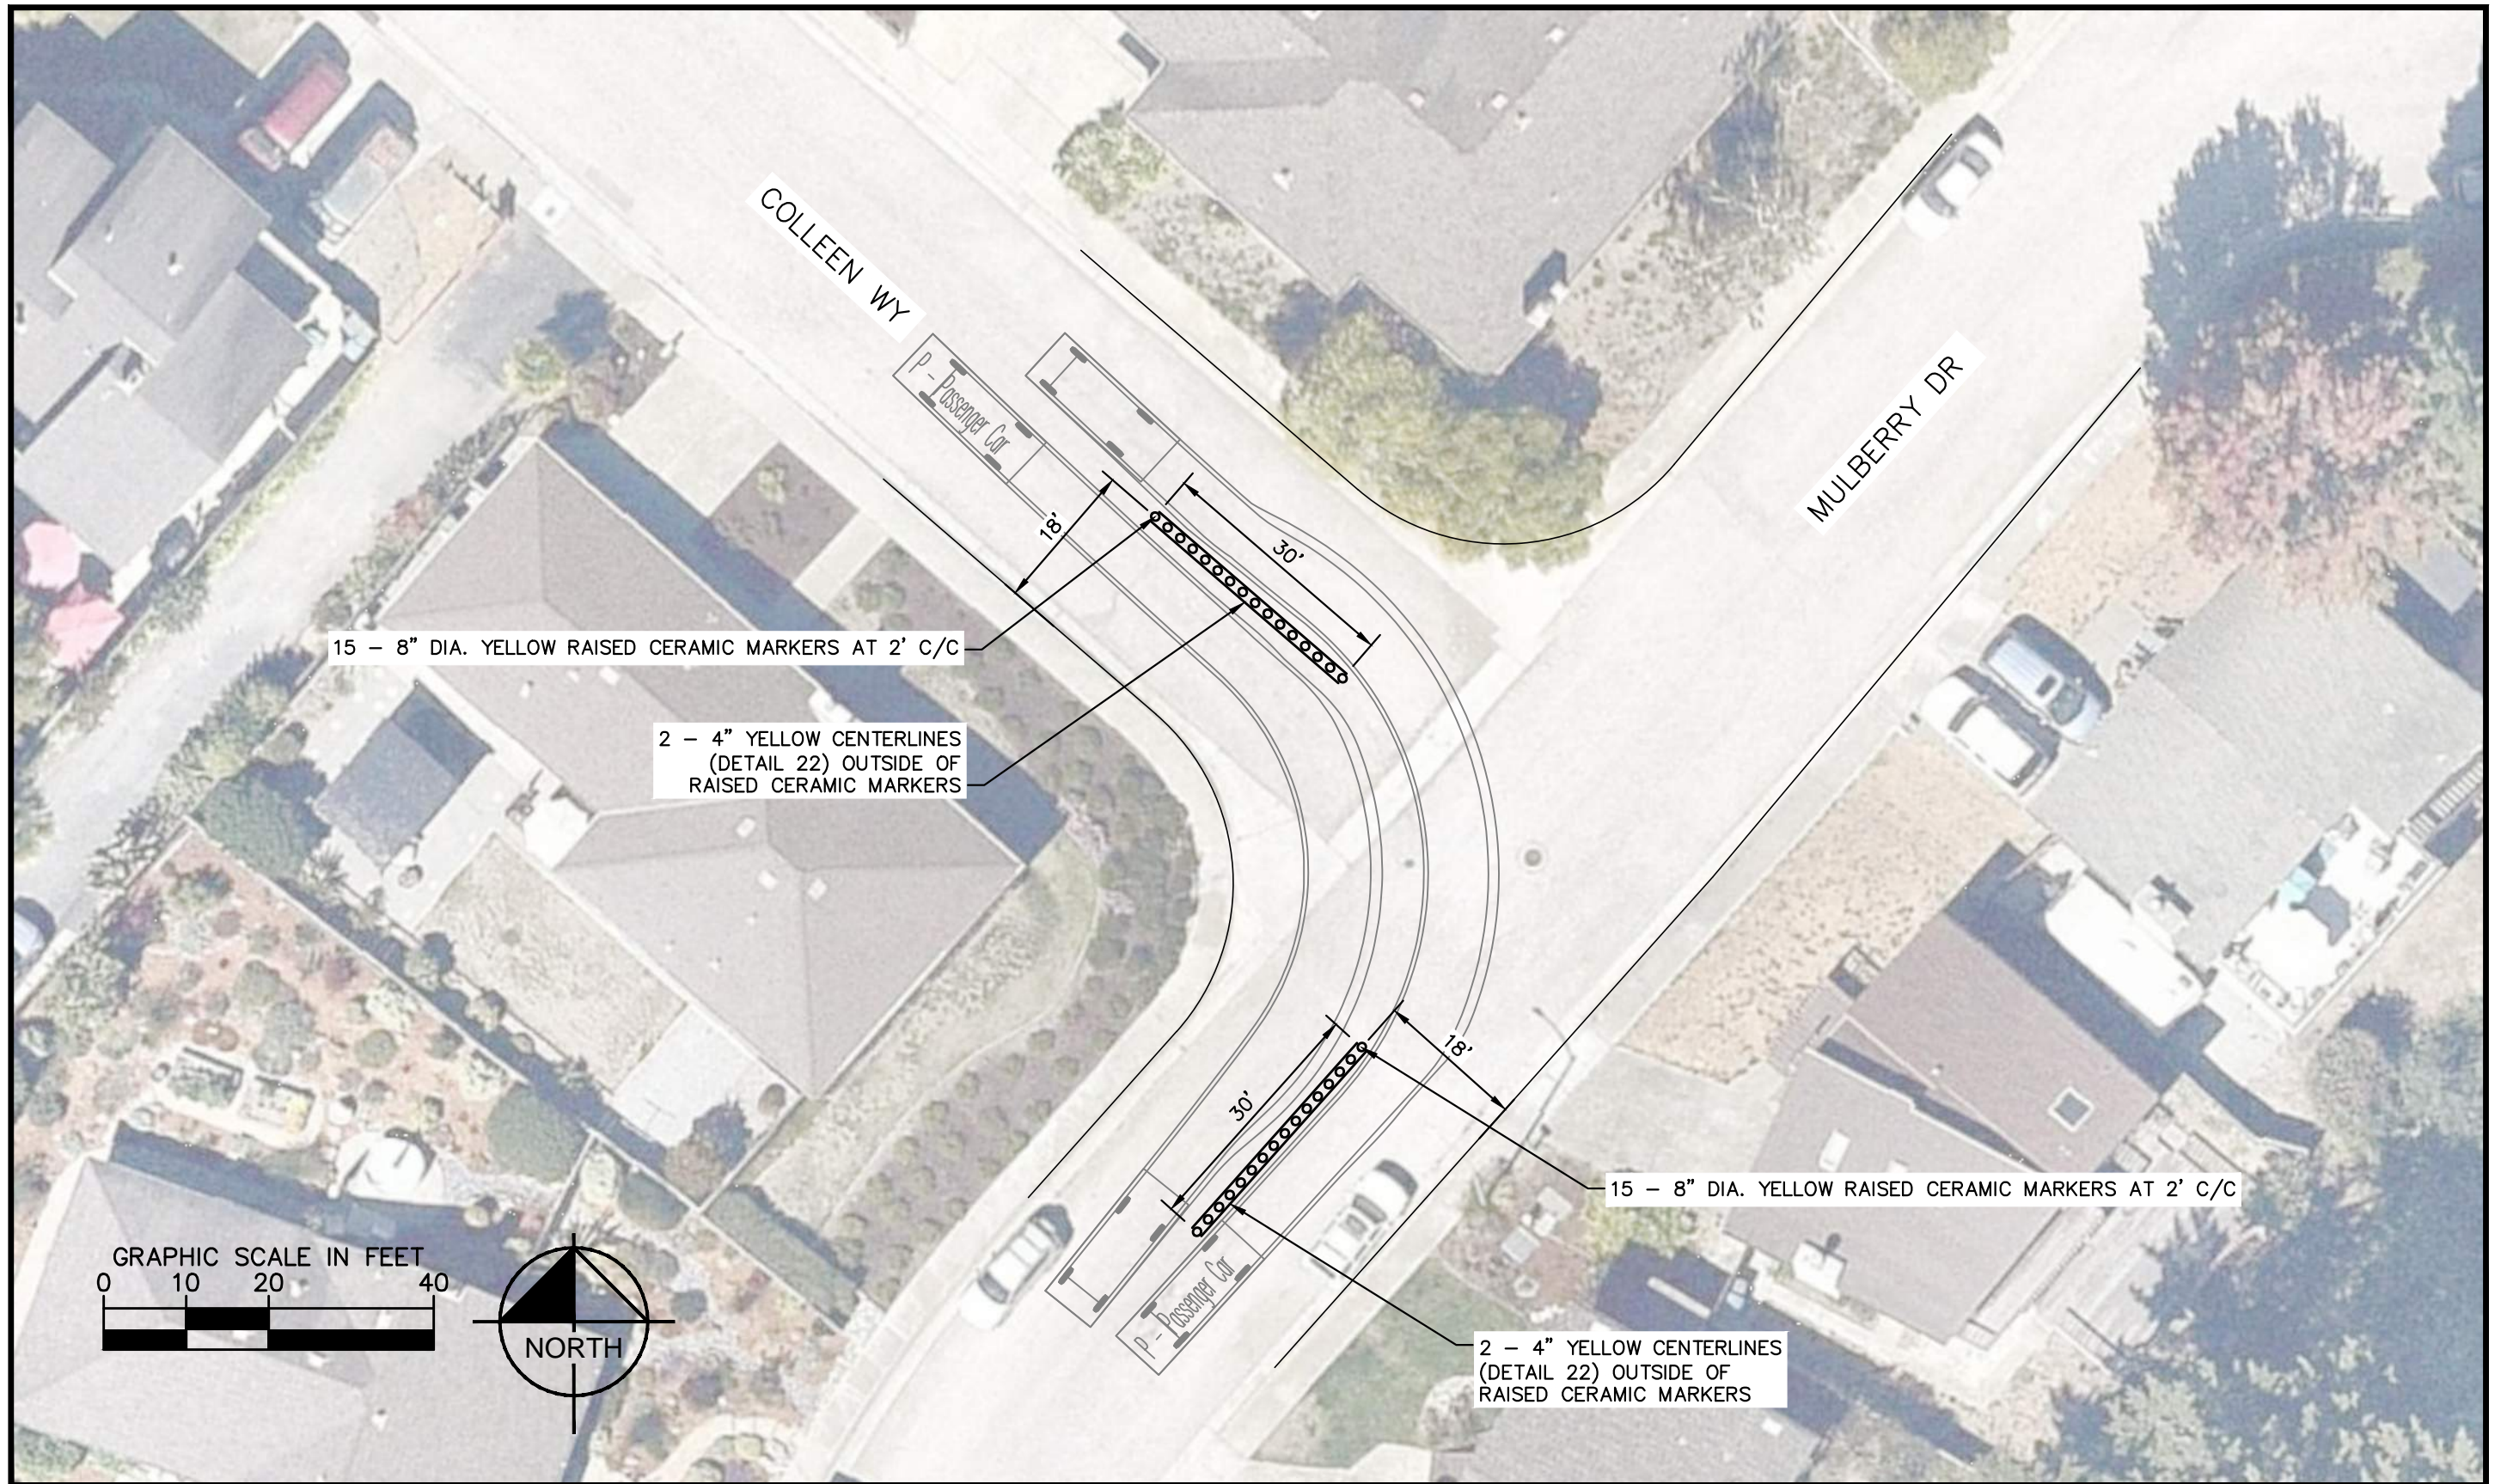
"Armadillo" Raised Pavement Markers (Cupertino, CA)
